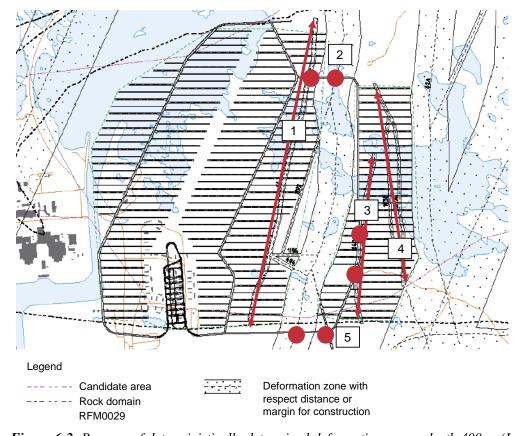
Passage of deterministically determined deformation zones, depth 400 m (Layout 1 and 2). Red dots indicate passages with transport tunnels or main tunnels and red arrows indicate passages with deposition tunnels. Numbers refer to the deterministically determined deformation zones given in Table 6-4.
